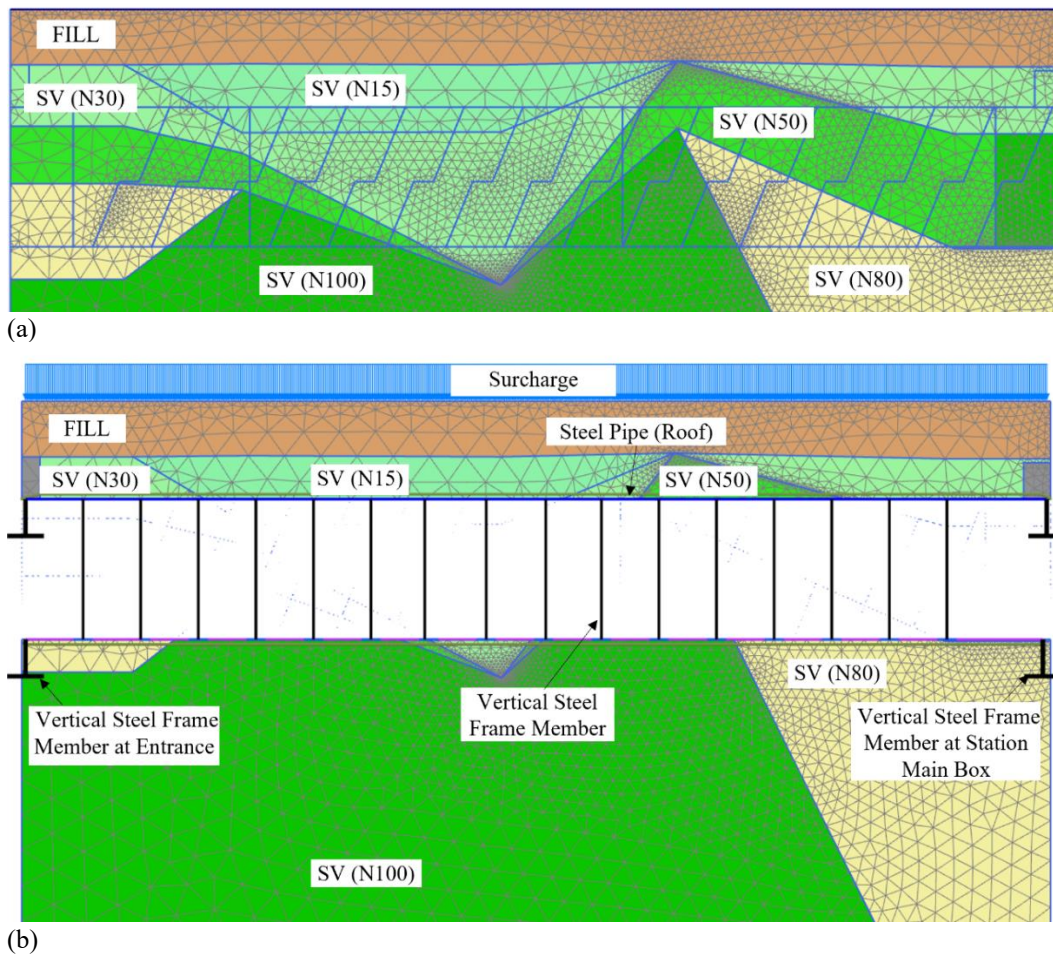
Finite element model: (a) without the structural elements; (b) with the structural elements.
